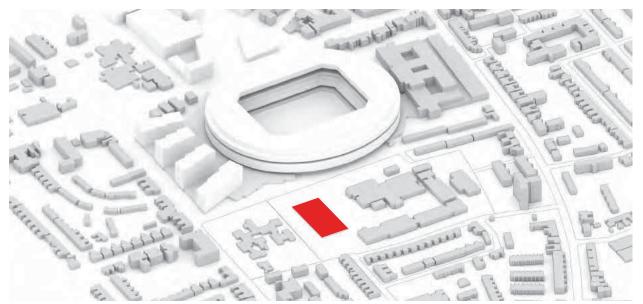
A 2500 sqm open space will be needed for outside broadcasting on match days
